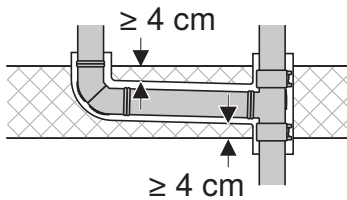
Concrete covering for branch discharge pipes embedded in concrete
